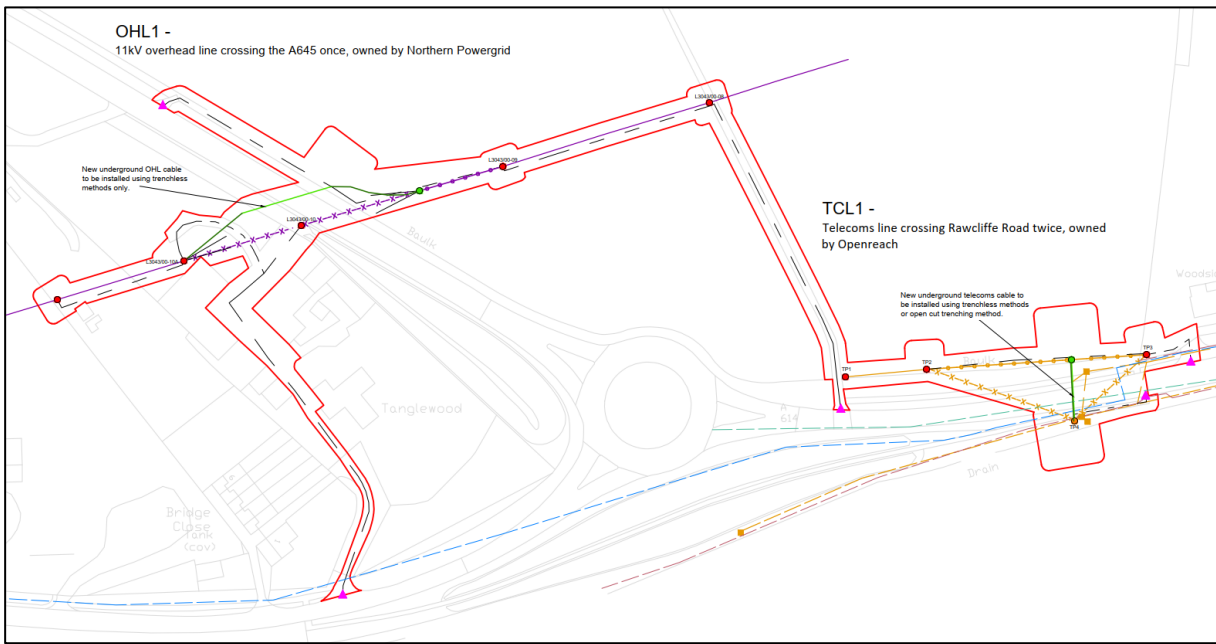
Drawing Showing Location of OHL1 and TCL1
